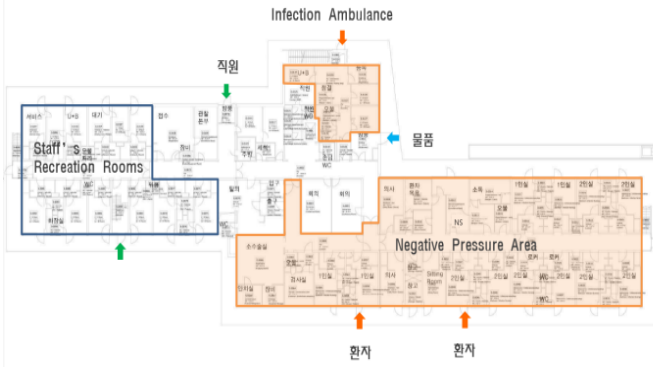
Typical Floor Plan of PMH Isolation Unit source (권순정, 2015: 36)
